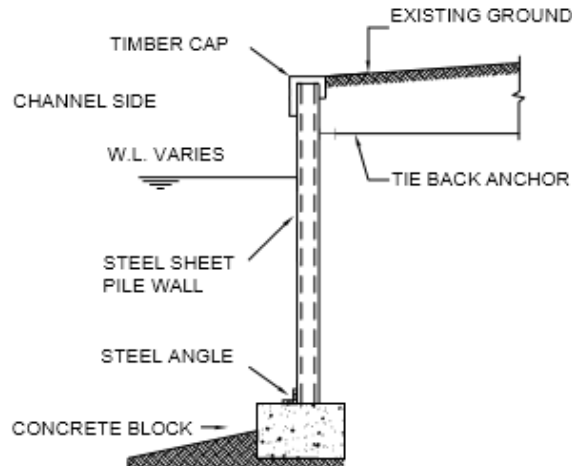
Typical Section at the East Steel Retaining Wall (#409)
